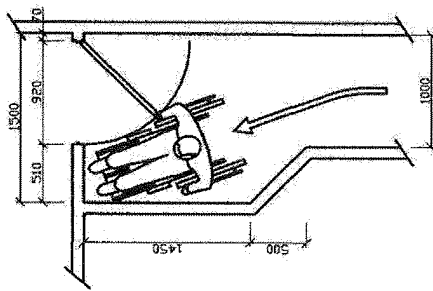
(b): Corrected Requirement Suggested for AS1428 Part 1-2001. This layout would be expensive to construct and would encroach further on the adjoining room space.
